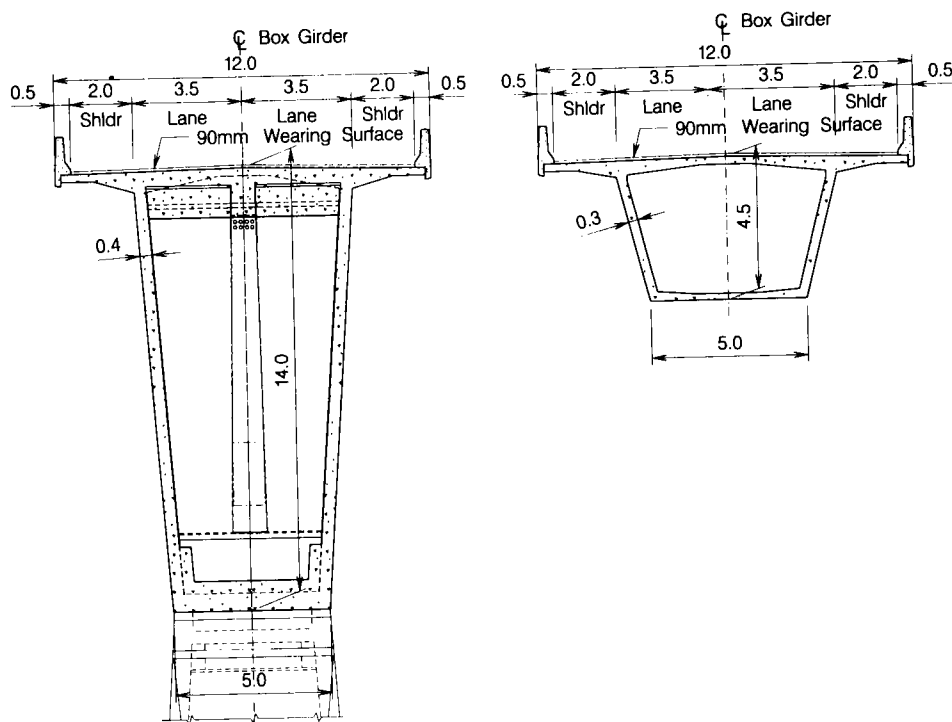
Typical cross section, main bridge: *left*, pier; *right*, midspan.
